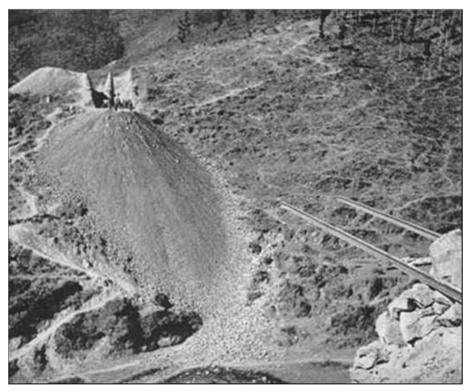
A section of the Yunnan-Burma Railway under construction, circa 1940.
